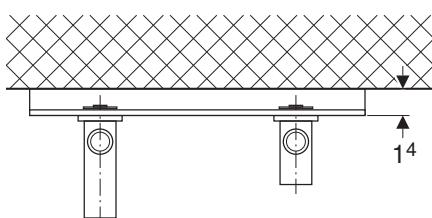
Installation dimension for exposed installation with a Geberit mounting plate, straight
